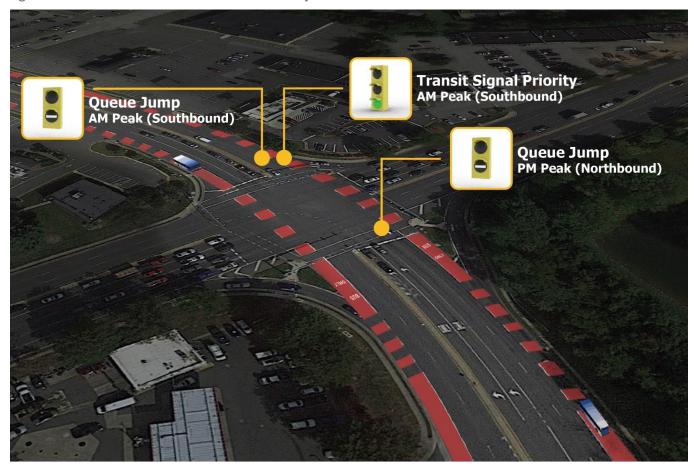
Dale Boulevard at Minnieville Road Potential Layout
